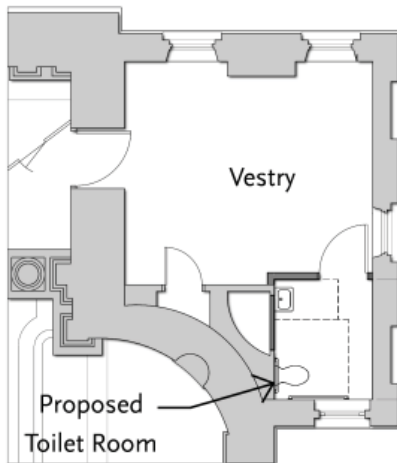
Proposed design for a new handicap accessible toilet room in the Vestry.
